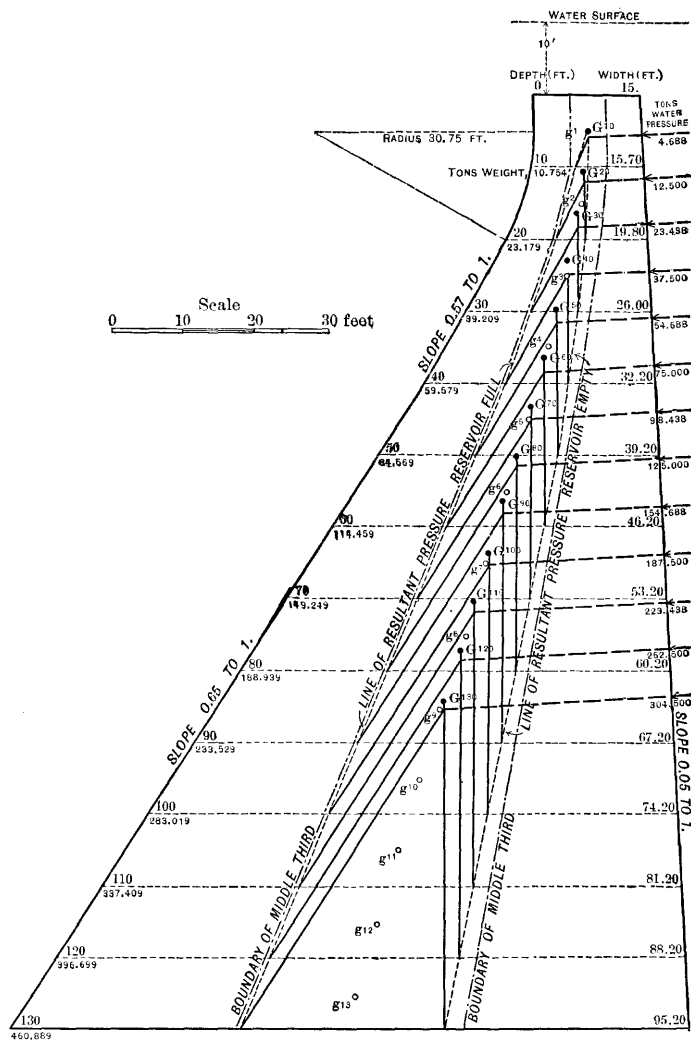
Section of masonry overflow weir dam based on masonry weighing 140 pounds per cubic foot.
